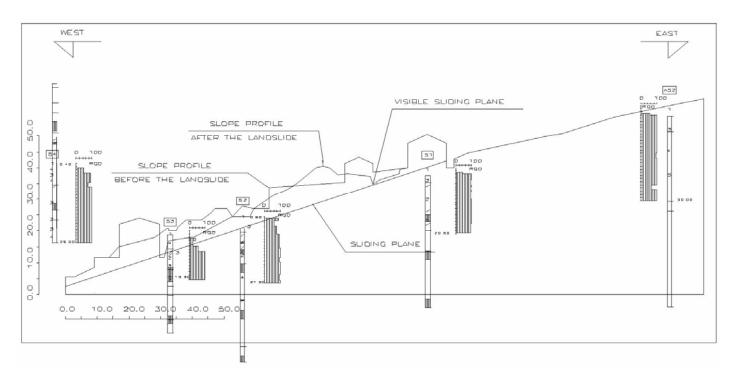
San Raffaele Cimena landslide: E-W cross section through the landslide area showing the plane of shear failure and the slope profiles prior and subsequent to the landslide.
